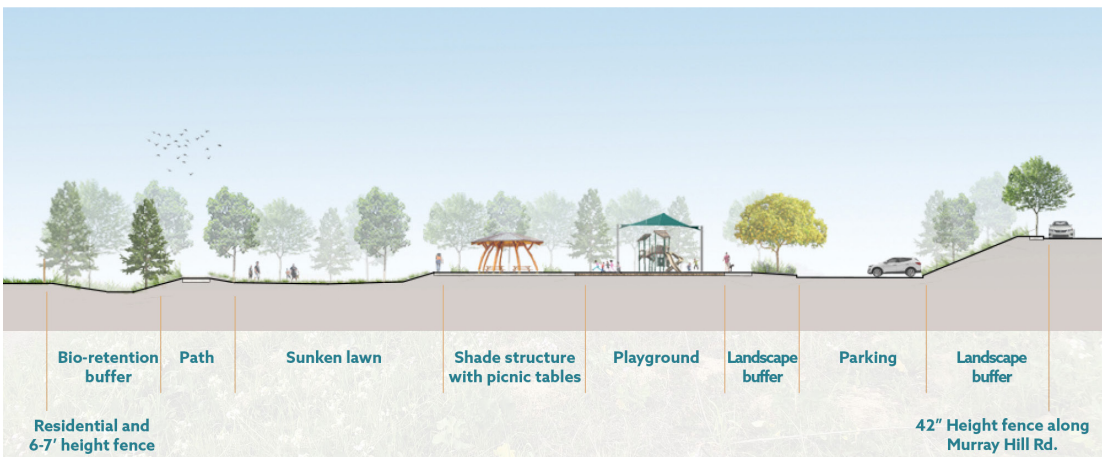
Section cut view from the west property line, across the playground to the east connection to Murray Hill Rd.
